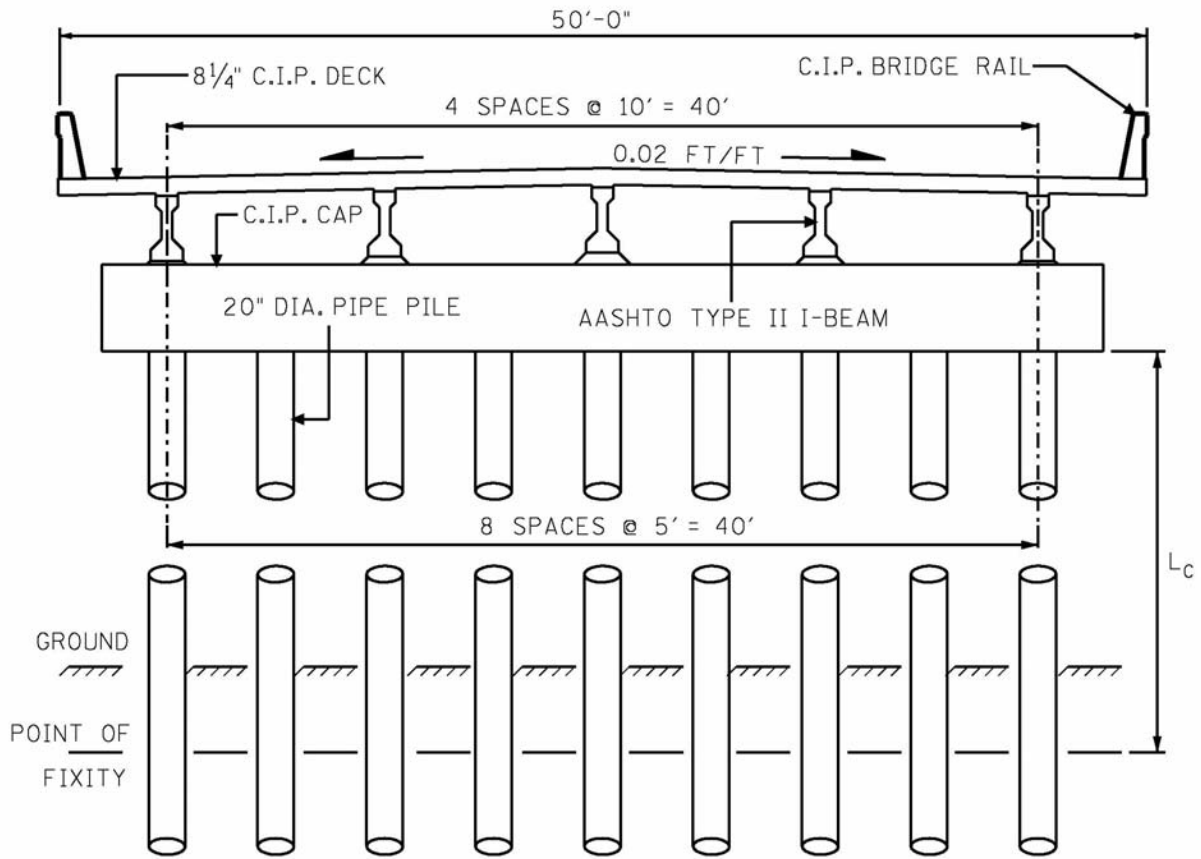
Cross-Section - Bridge Nos. 1 and 2
